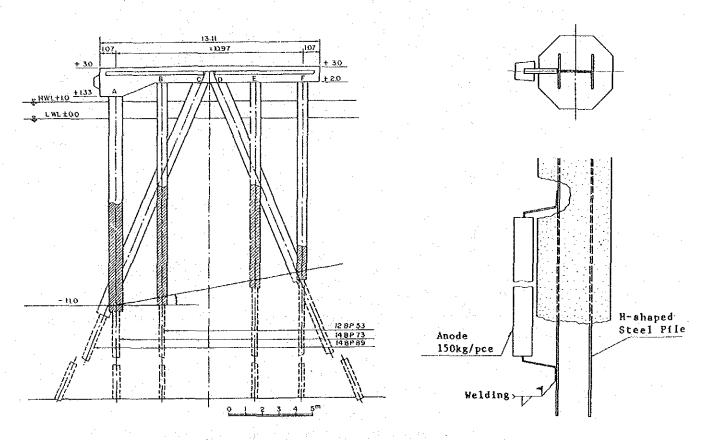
Aspect of Damaged H-shaped Steel Piles (The First Row)
